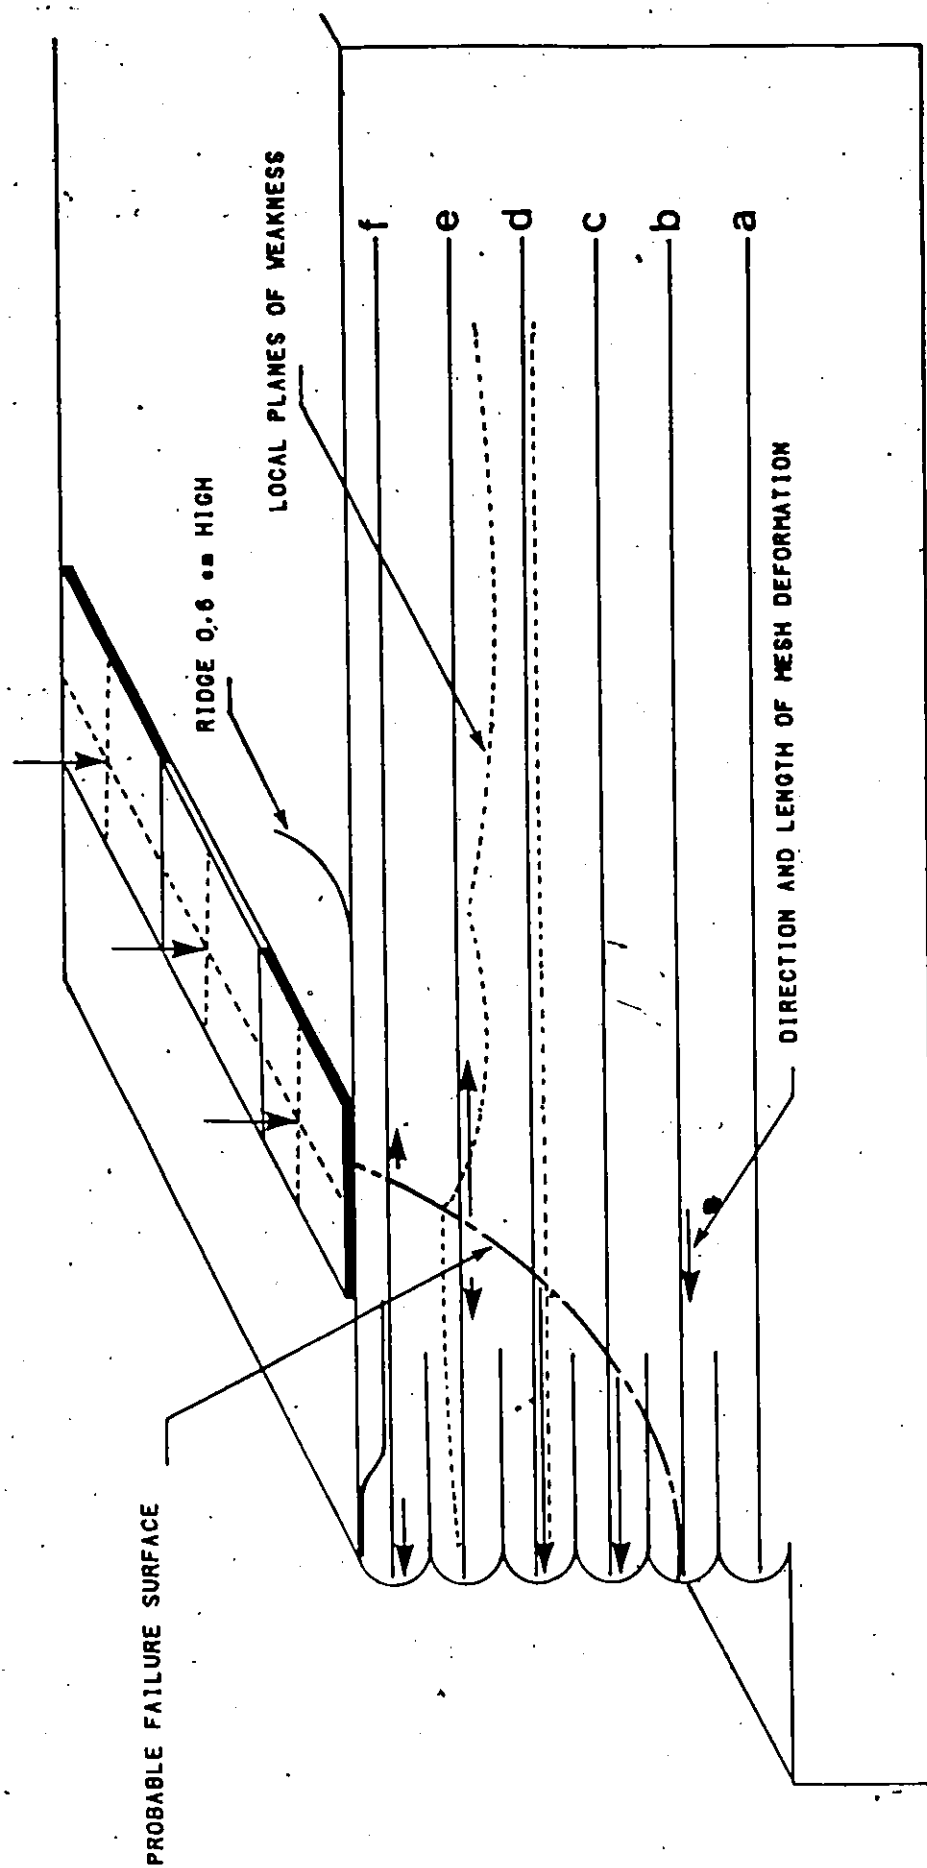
FAILURE SURFACE IN REINFORCED WALL STRUCTURE W-2
